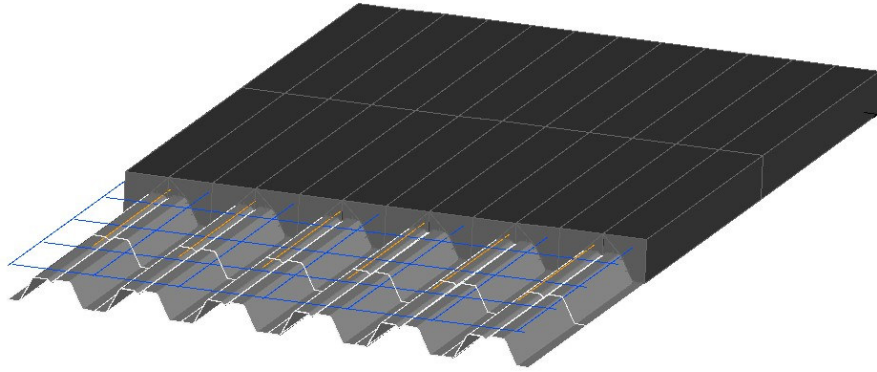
Model of the composite slab with a continuous rebar (blue) and reinforcement bars over the beams (orange).
